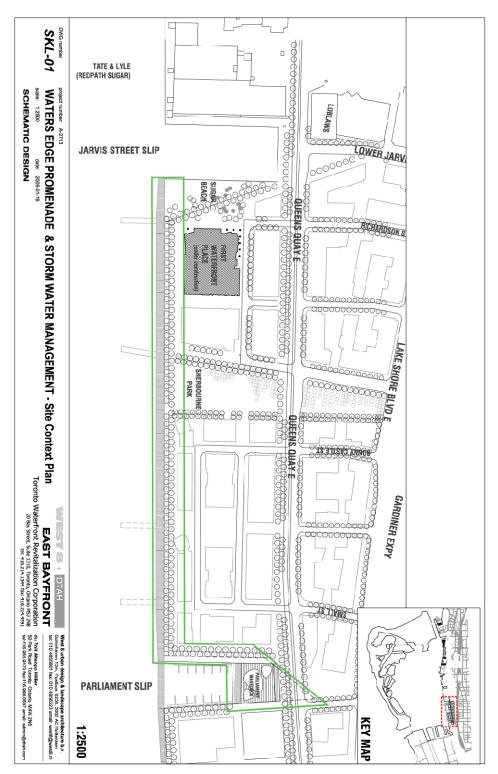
Waters Edge Promenade and Stormwater Management -Site Context Plan
